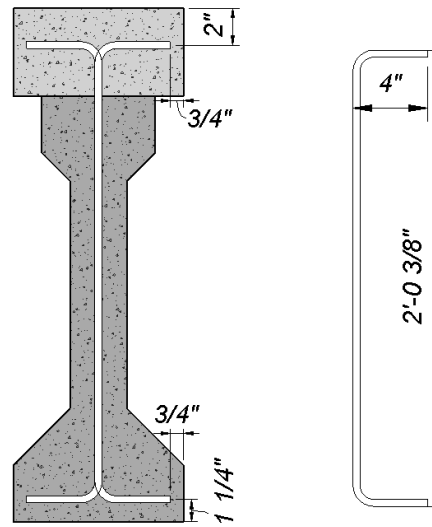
(Left) Stirrup placement in the girder cross-section and (right) stirrup dimensions
